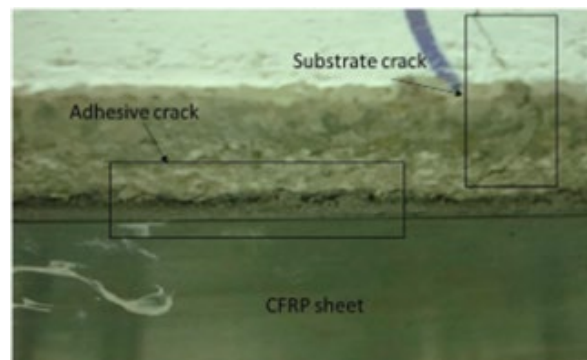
Cracks in concrete substrate (Malla et al. 2023)
